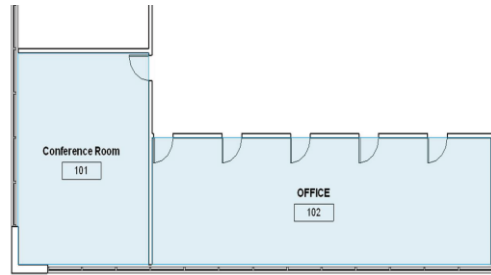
Zone-Based Modeling - Floor Plan (IES, 2010)
